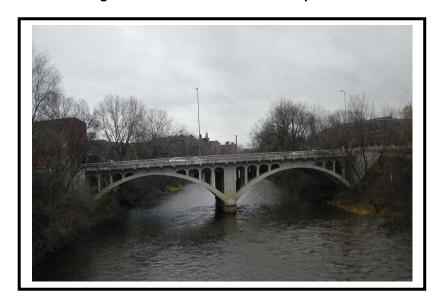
4-39: Open-Spandrel Reinforced Concrete Arch
